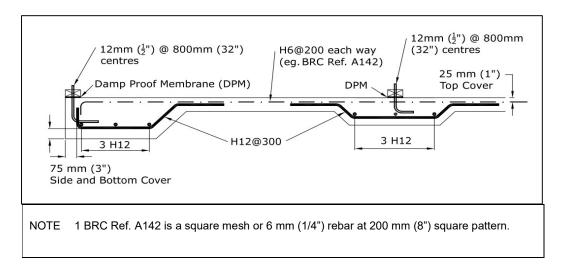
Rebar layout of slab-on-ground footing for timber framed walls
